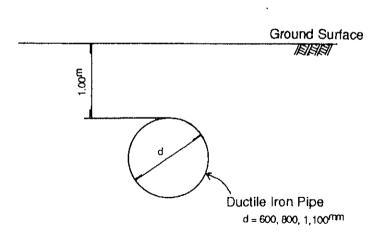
TYPICAL DESIGN OF STORM SEWER
